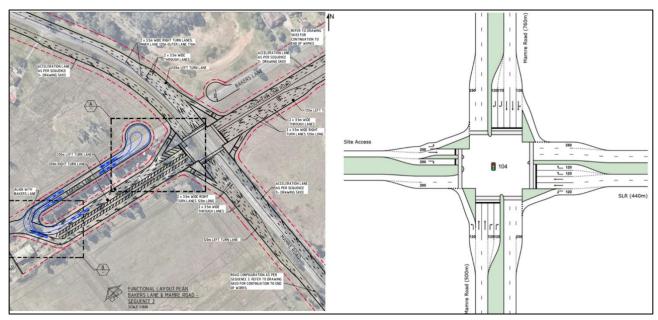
Approved Sequence 2 Mamre Road / Bakers Lane Signal Layout
